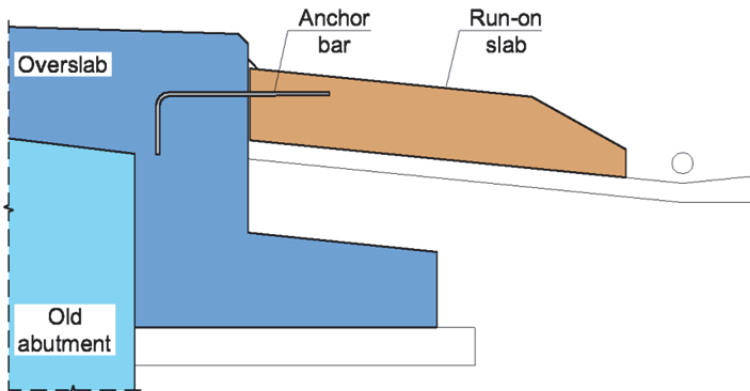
Longitudinal section through the end of superstructure and run-on slab
